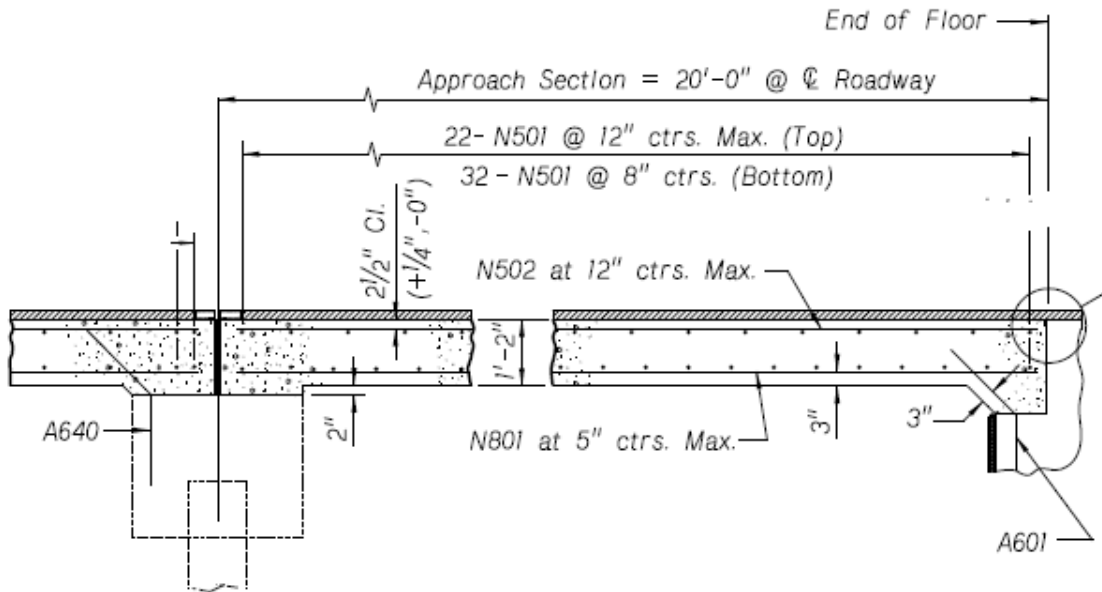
A typical section that shows the dimensions and reinforcement of the approach slab in the new design of Nebraska.
